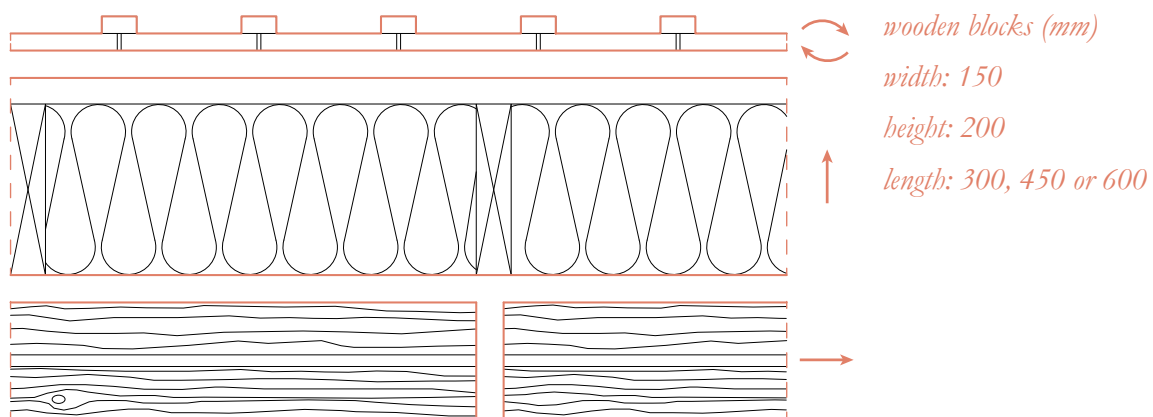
Bosum building system, assembling at building site, source: Bosum AB
